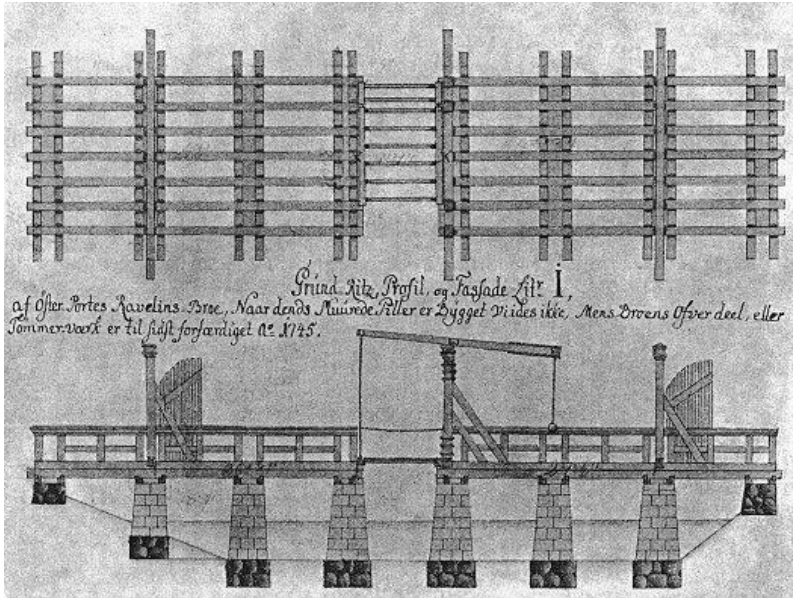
Comparable example of a bridge structures in the 17th century. The last bridge at Østerport with stone pillars and draw-bridge. From Pontoppidan 1936.
